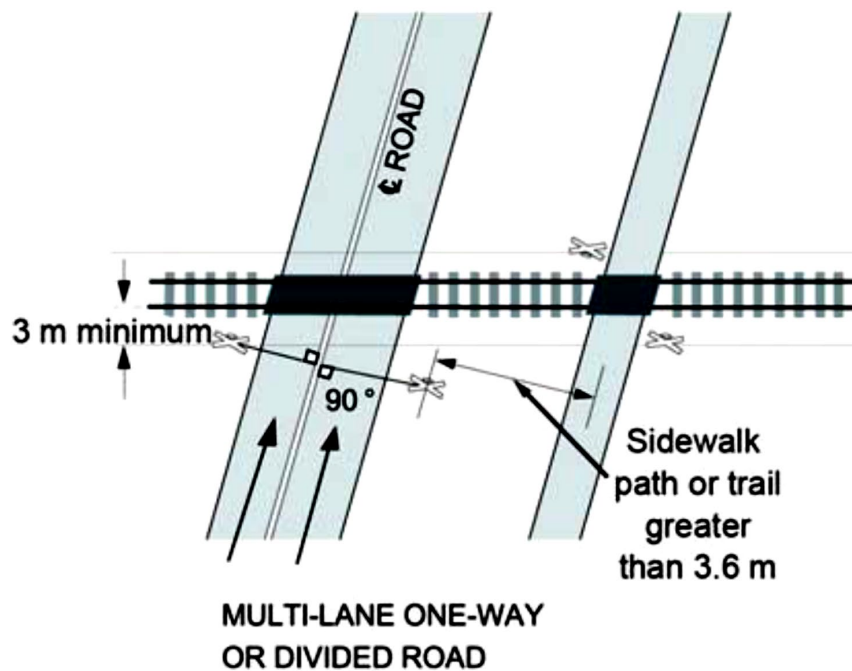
Figure SUB-PART E – 10 – Location of Railway Crossing Signs (Sidewalk, Path, Trail > 3.6 m)
